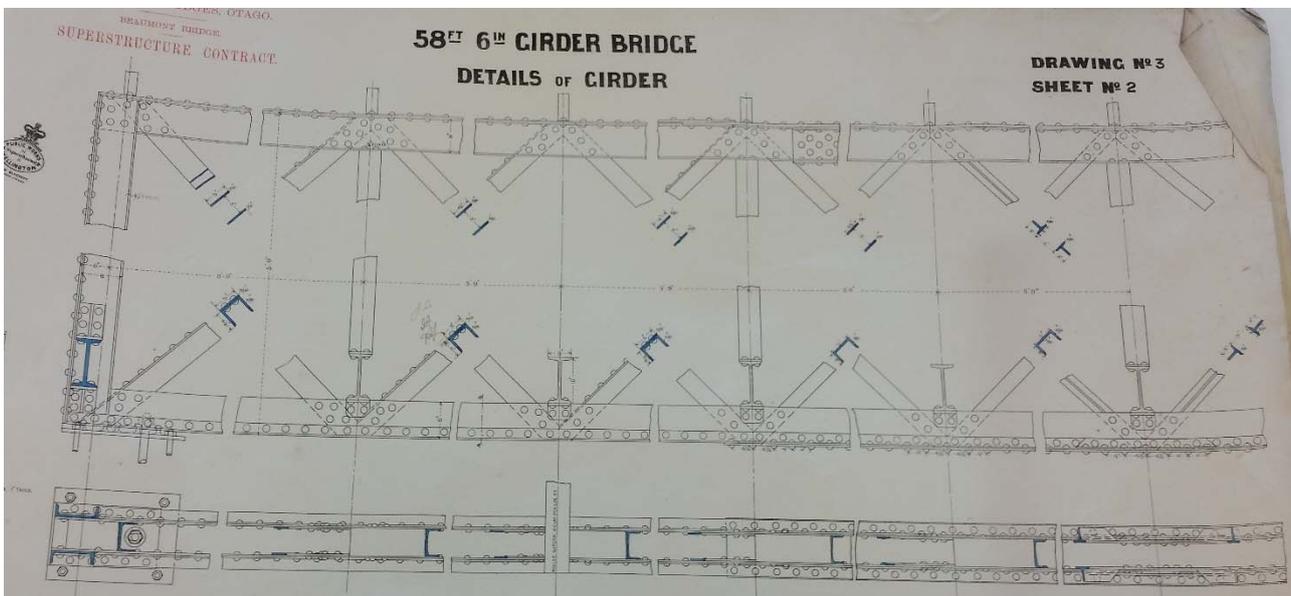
Details of the 58ft 6in lattice girders of Beaumont Bridge.
